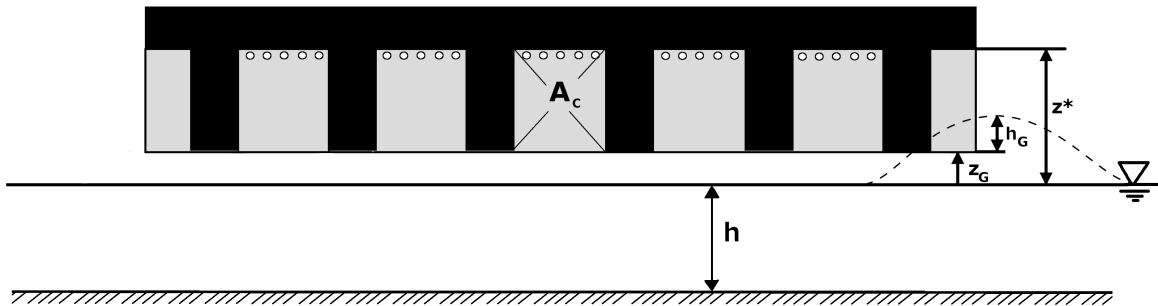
Model elevations tested are such that (a) the girders are submerged ($z_G < 0$) or (b) girders are elevated ($z_G > 0$) above the SWL, where z_G is the vertical coordinate from the SWL to the bottom of the girders. Air cavity area (A_c) is the area between each pair of girders and is a function of z^* , the distance between the SWL and the bottom of the bridge deck. h_G is the water surface elevation in the air cavity area in the absence of entrapped air. Not to scale.
